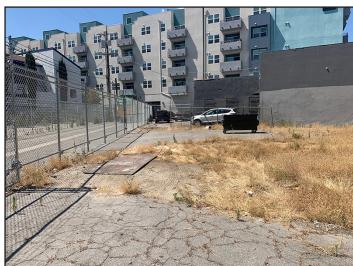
Northeasterly view of Project Site from Hesby Street. Photo taken May 14, 2020.
